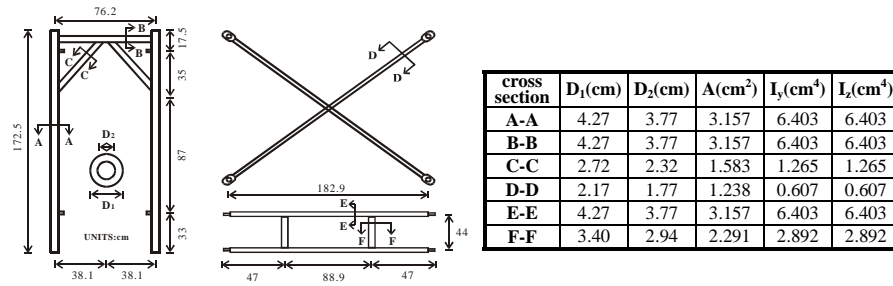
Dimensions of scaffolding unit, plank and cross-brace
